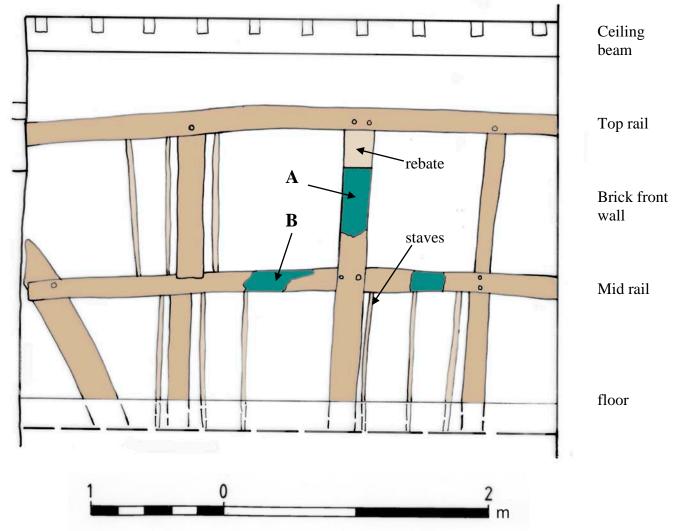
Brick House, first floor - timber frame forming south-east wall (5); surviving wall painting shaded green. Later timbers omitted.
